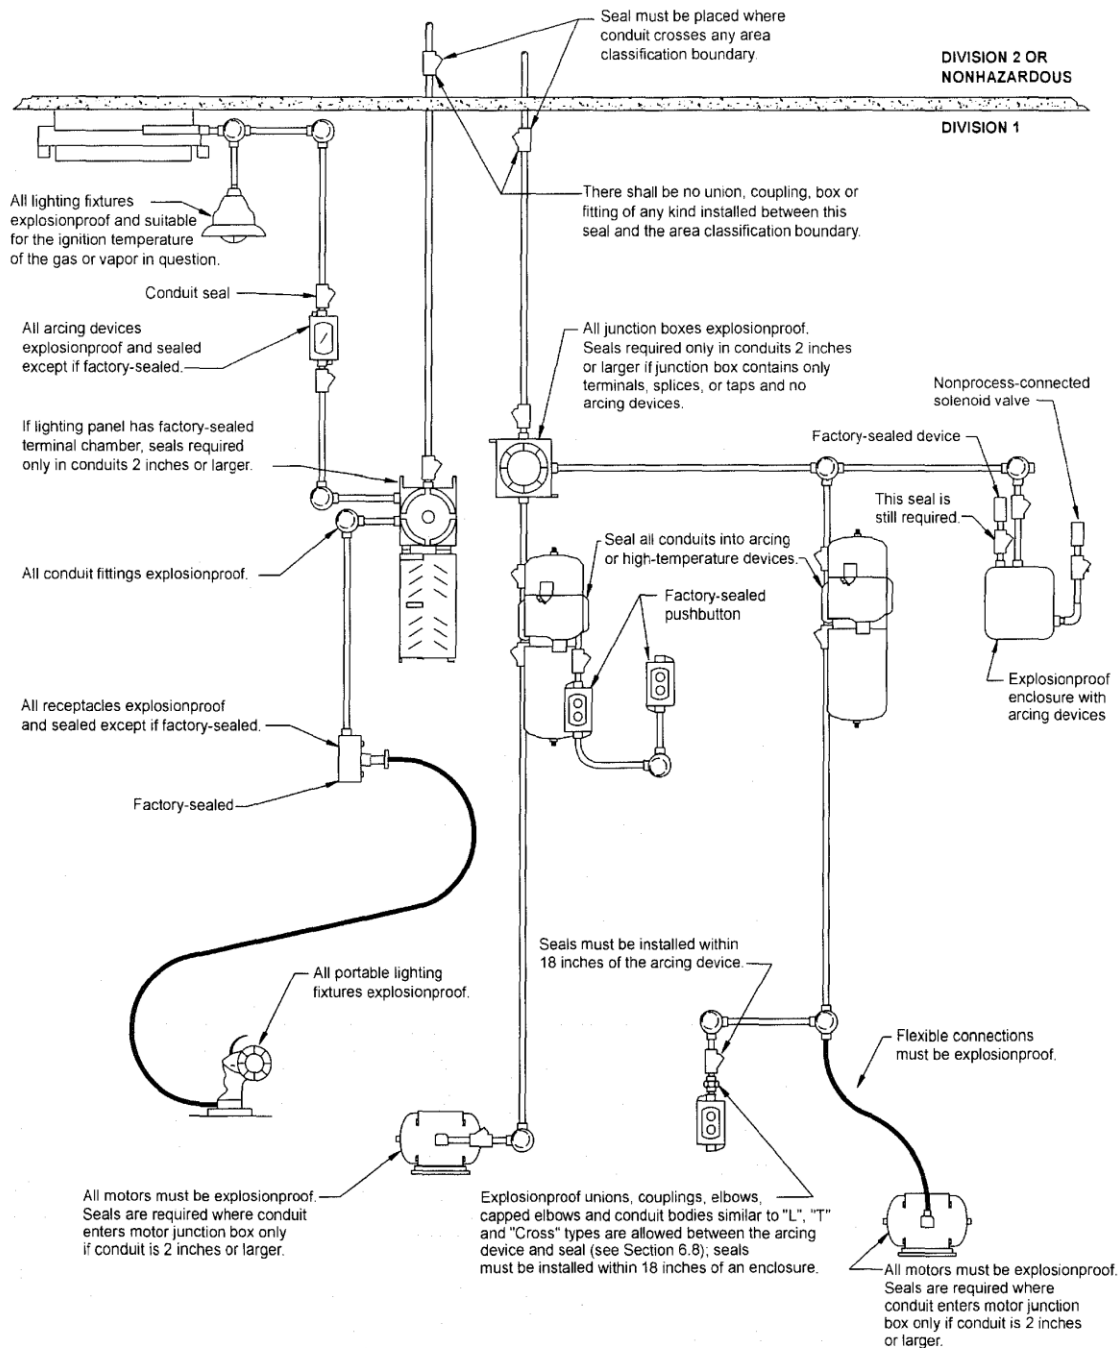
Typical Class 1, Division 1 Electrical Installation Conduit System
